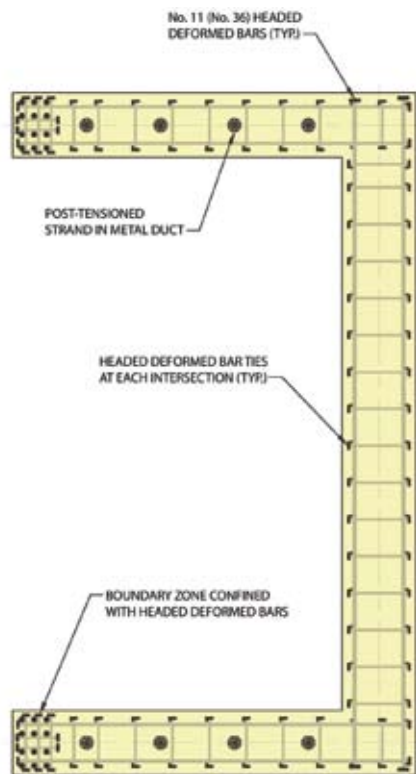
Reinforcement for a typical structural wall at the level detailed as a plastic hinge region
